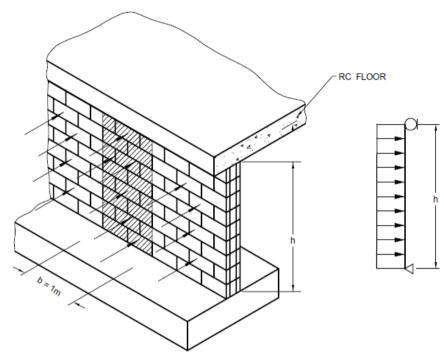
UNIT LENGTH B OF MASONRY WALL CONSIDERED FOR OUT-OF-PLANE BENDING IN THE VERTICAL DIRECTION
